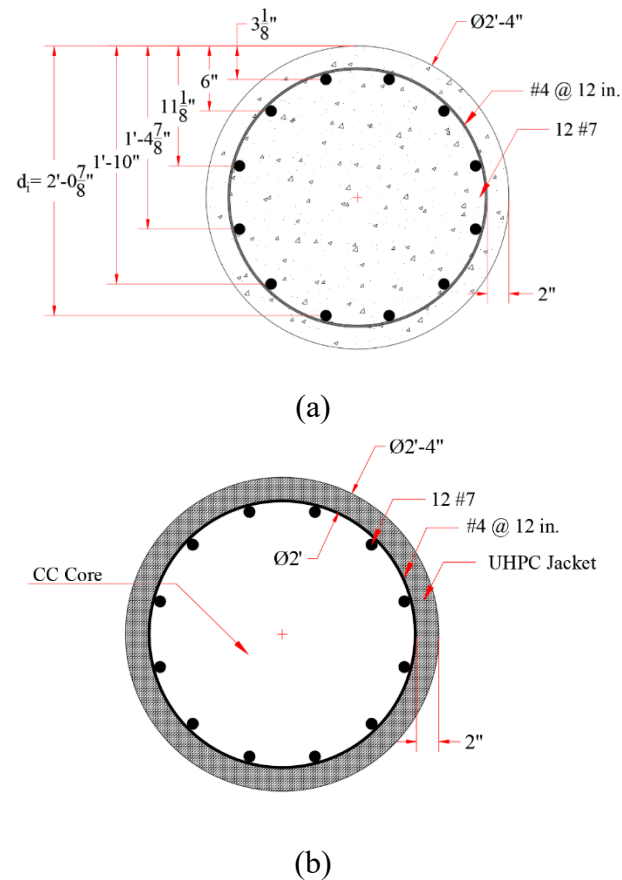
Cross section and reinforcement of the example column a) before repair and b) after repair
